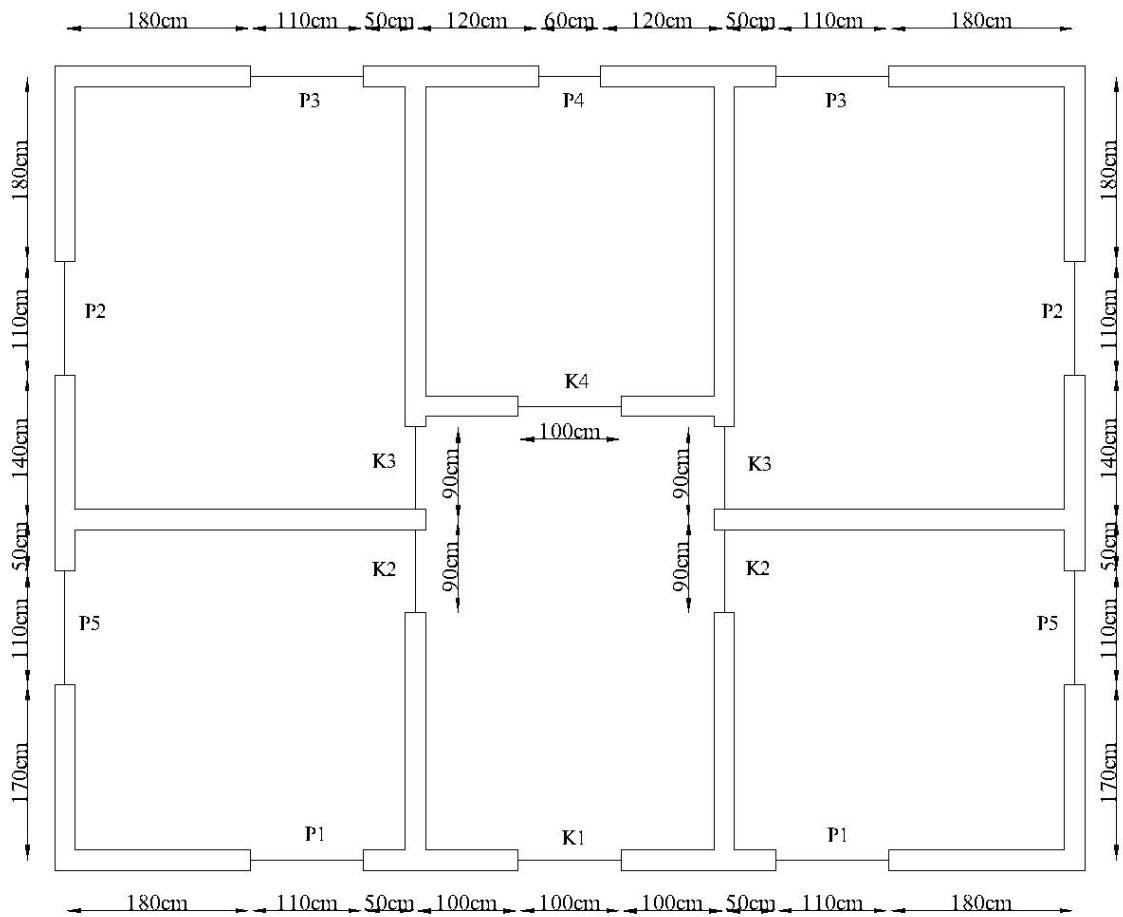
1. Plan geometry of the masonry building model of R1W1 subclass.
